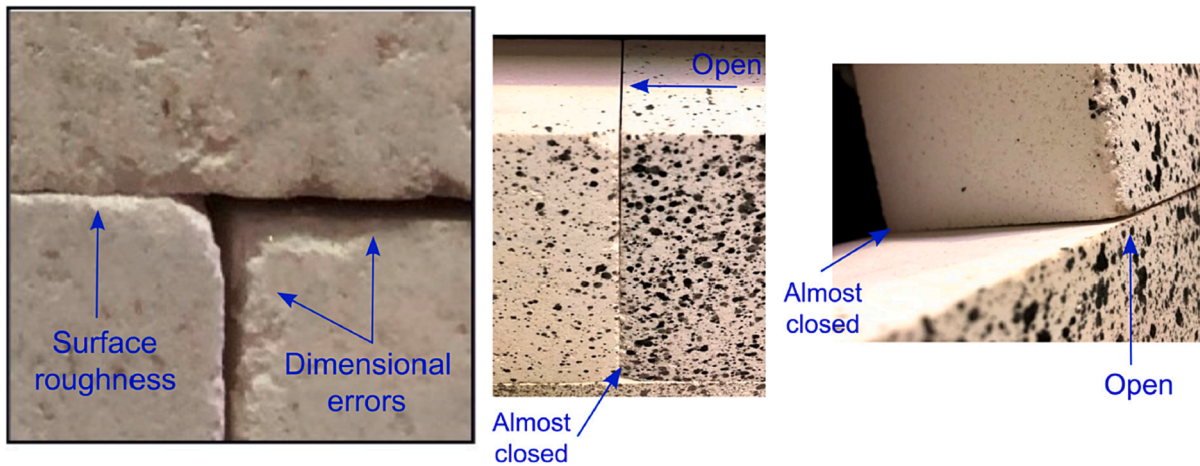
Nonuniform dry joints thickness and limited initial contact caused by the dimensional and shape tolerances of the bricks.
